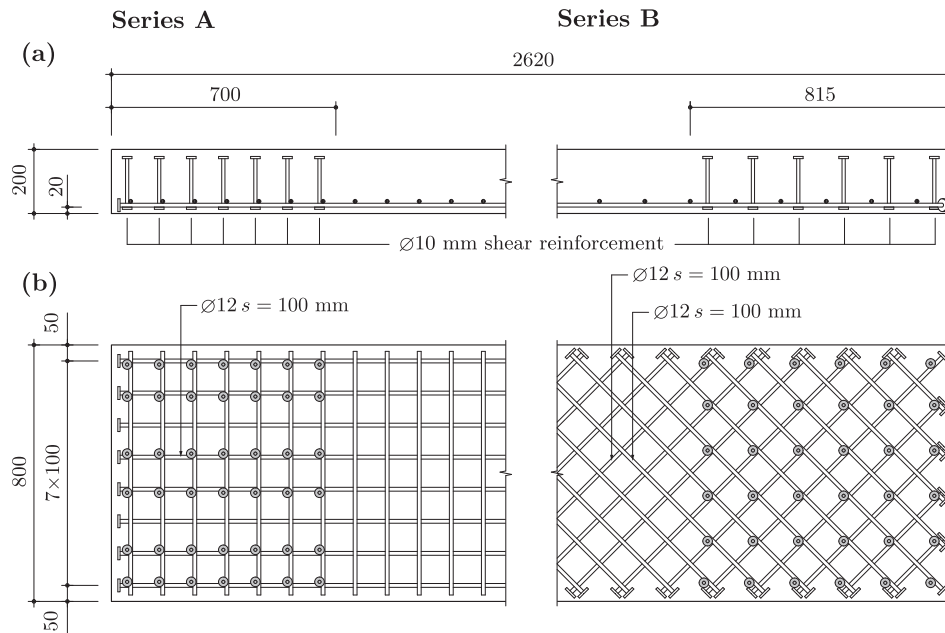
Geometry and reinforcement: (a) side view; (b) plan view. Dimensions in mm.
